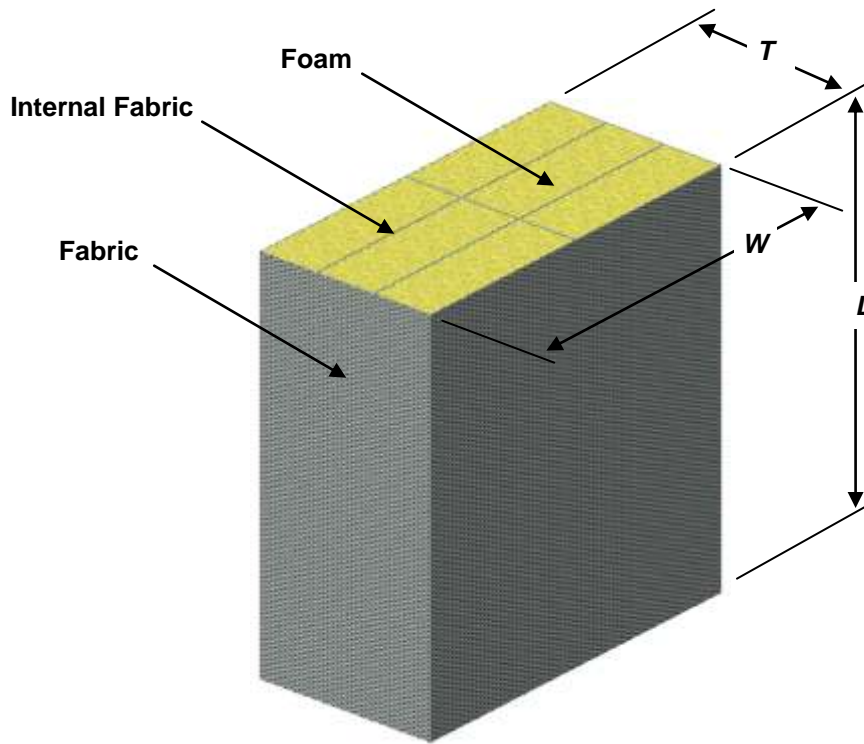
General layout and dimensions of the sandwich beam tested specimen
